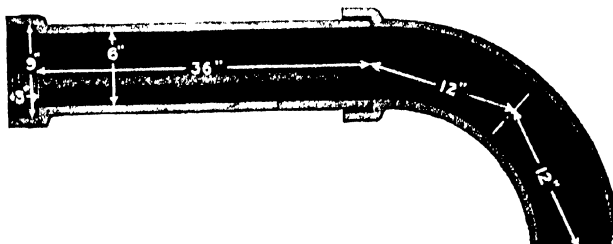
, ACID PROOF TROUGH OR SPLIT PIPE
